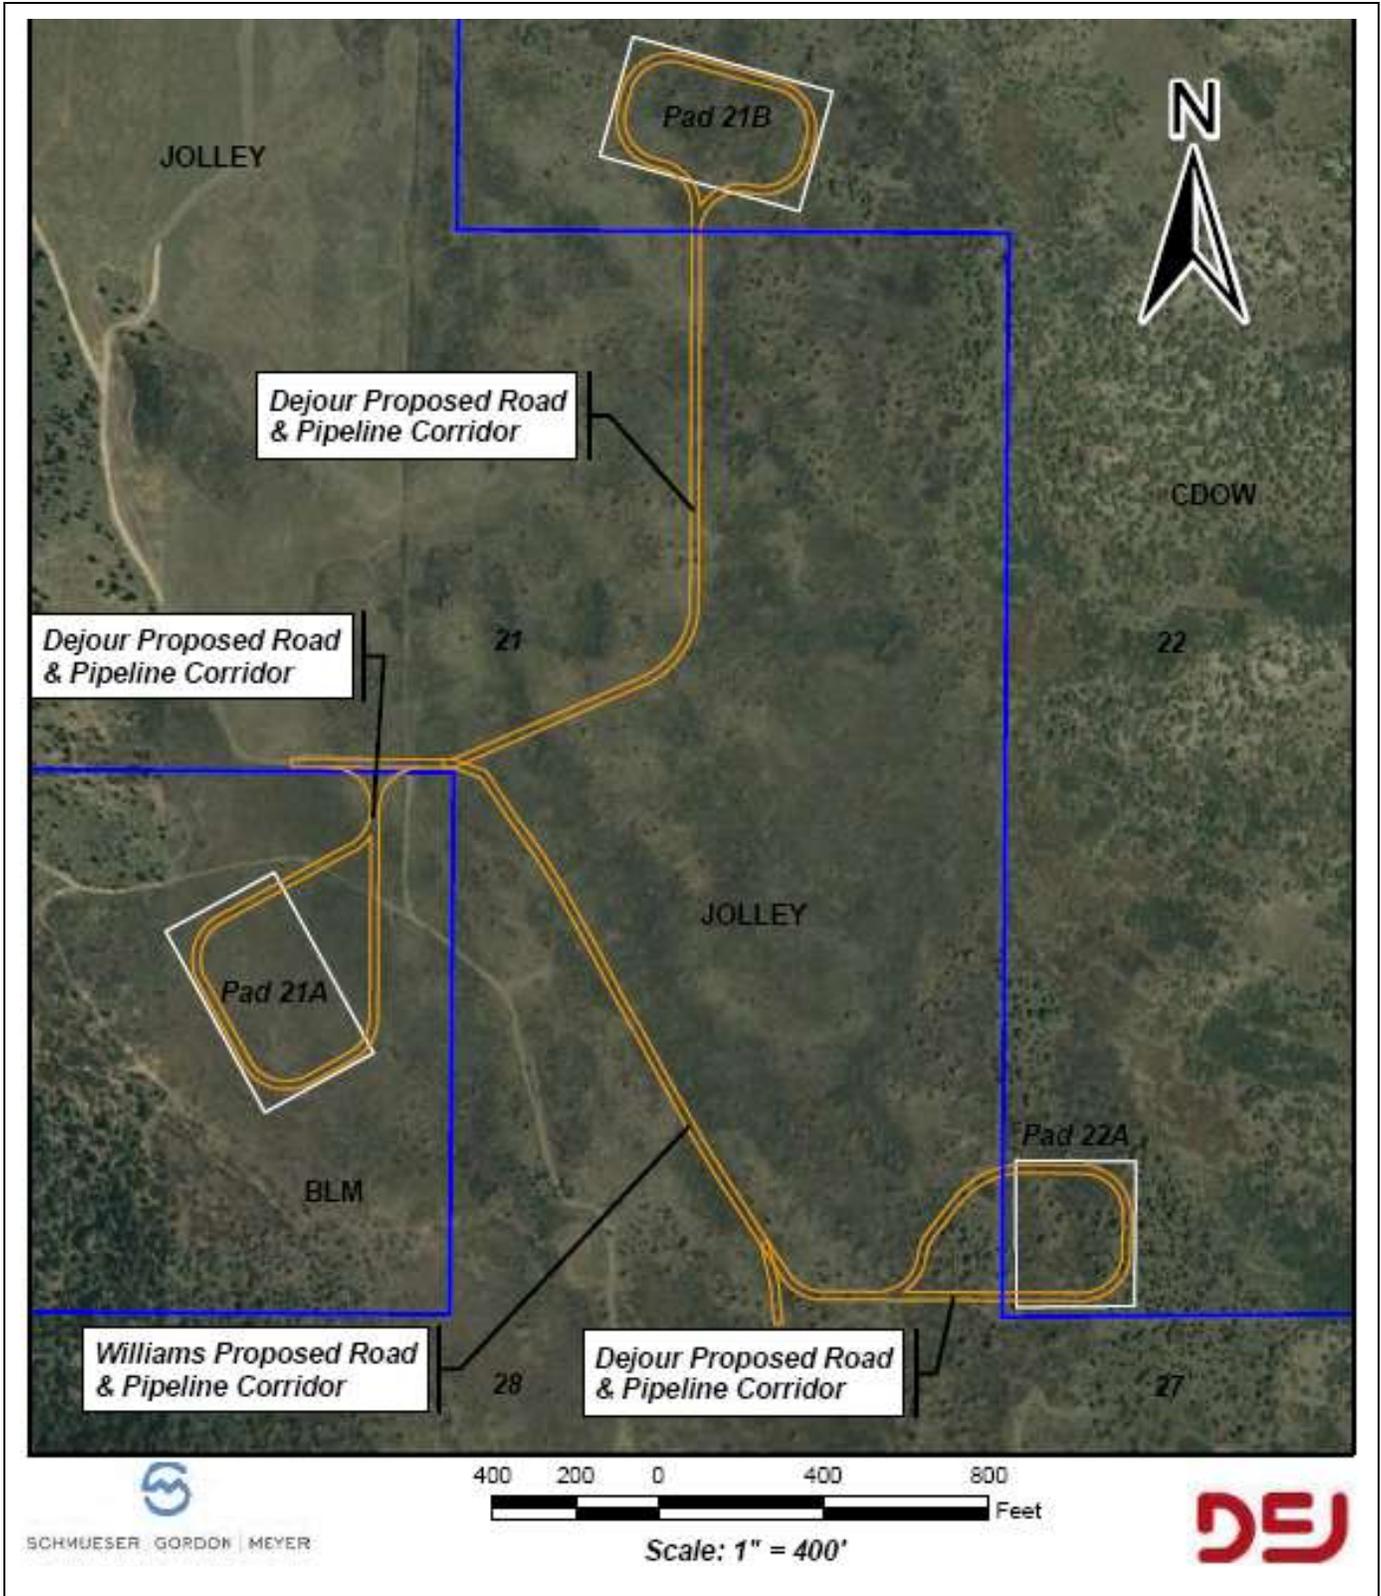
Dejour Section 21 Proposed Pads, Roads, and Pipelines
